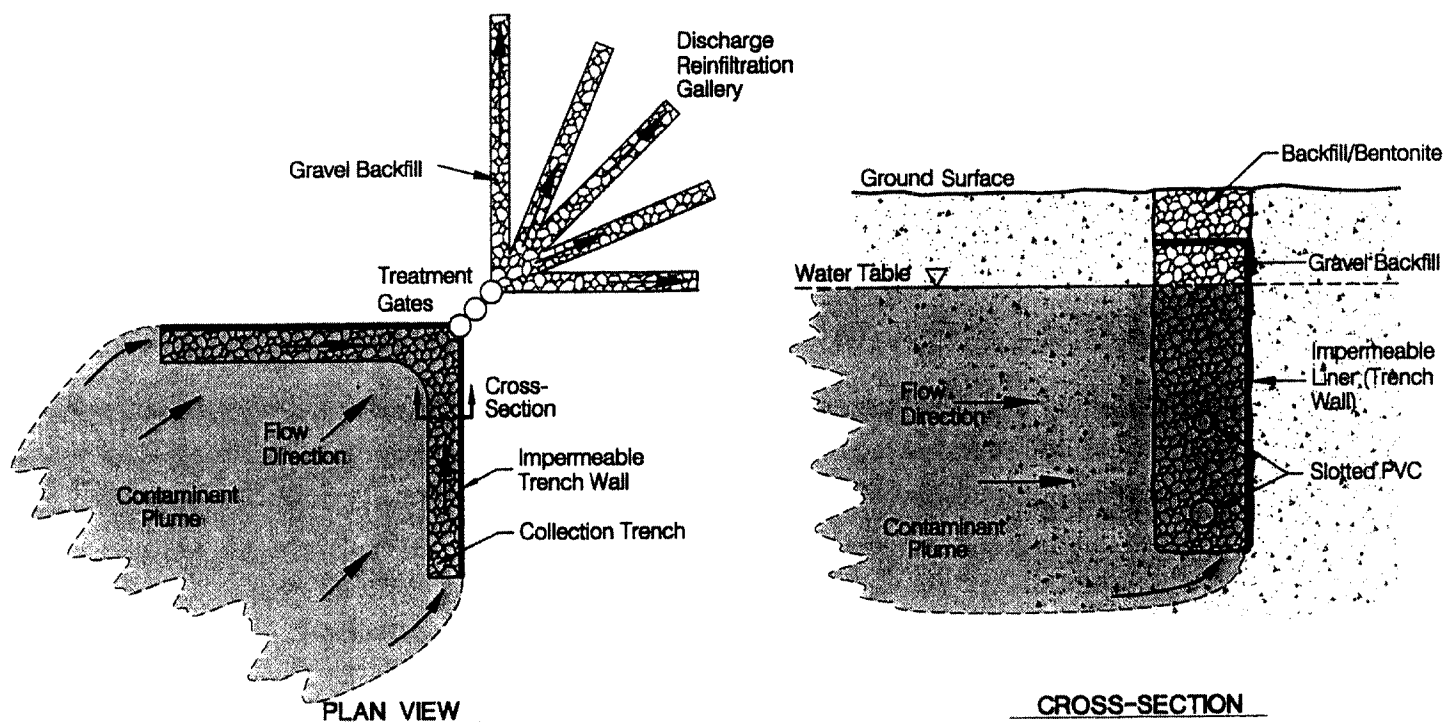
Plan view and cross section conceptual schematics of the trench and gate system.
